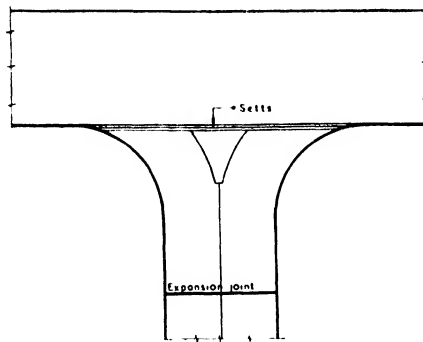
JUNCTION OF CONCRETE AND MACADAM ROADS.
